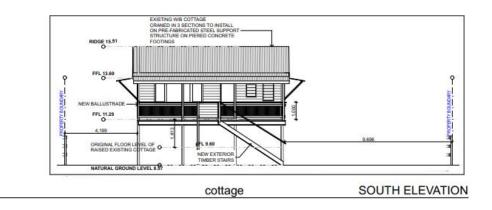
Extract of elevations plan for raised 2-bedroom dwelling.
